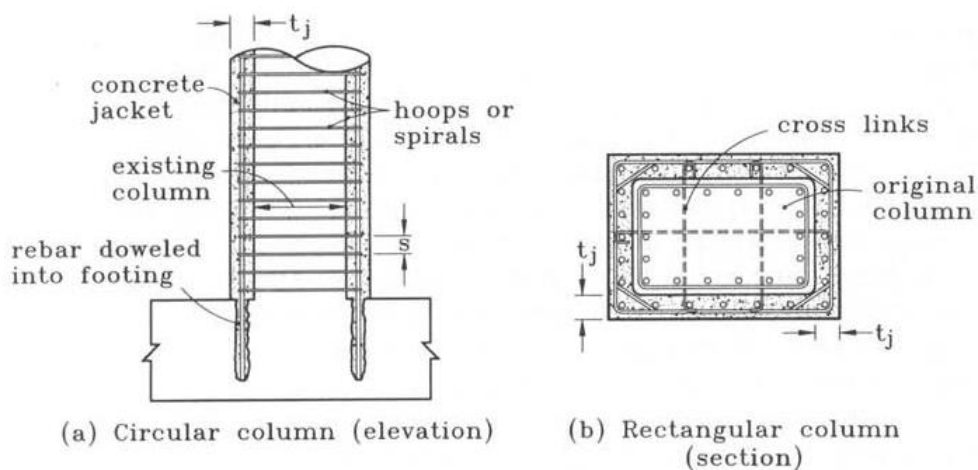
Typical Layout of Concrete Jacketing Retrofit (Priestley et al. 1996)
